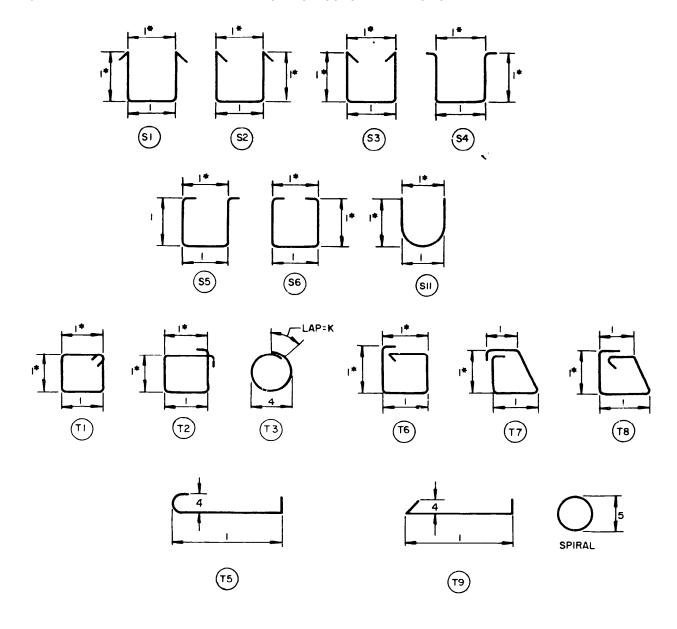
(a) - Standard fabricating tolerances for bar sizes #3 through #11
